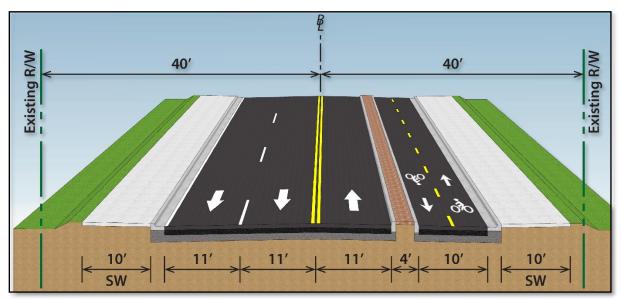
Proposed Typical Section – Whiting Street (Brush Street to Meridian Avenue)
